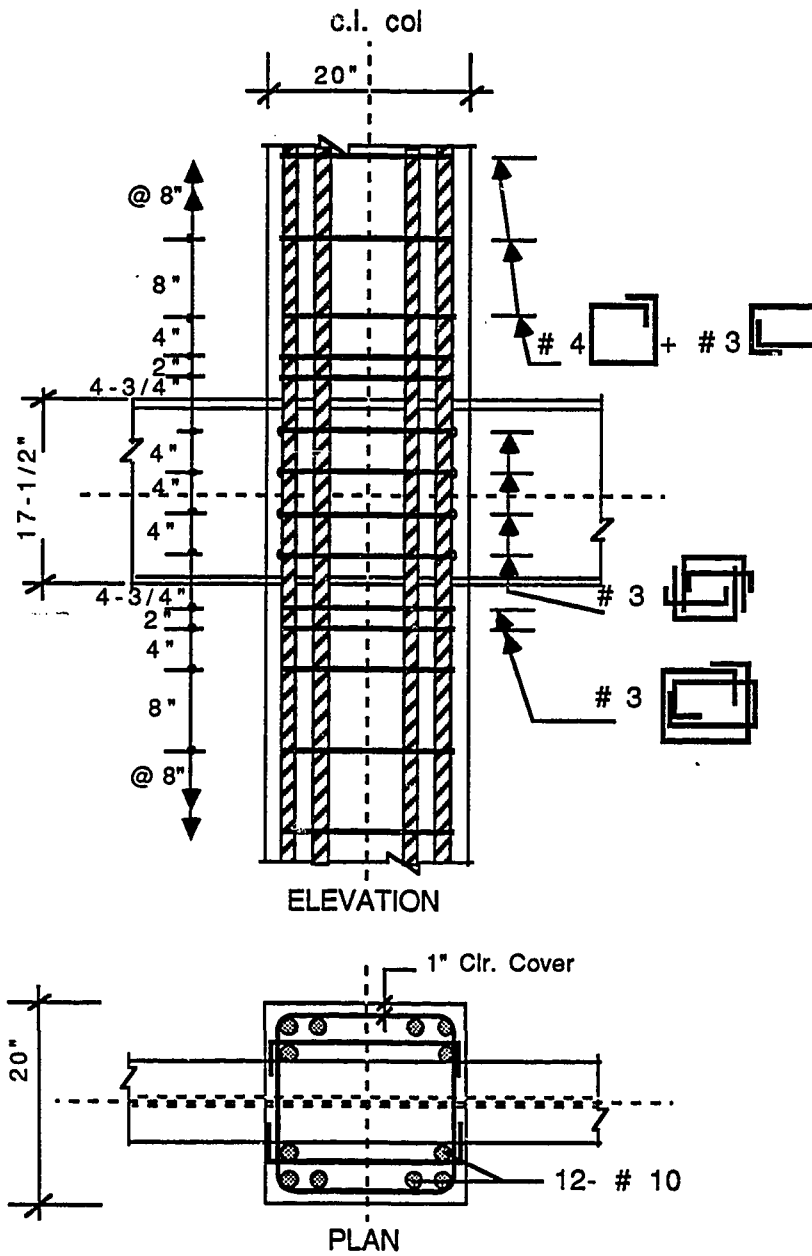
(b) Joint reinforcement for specimens 3 thru 7 and 9.
